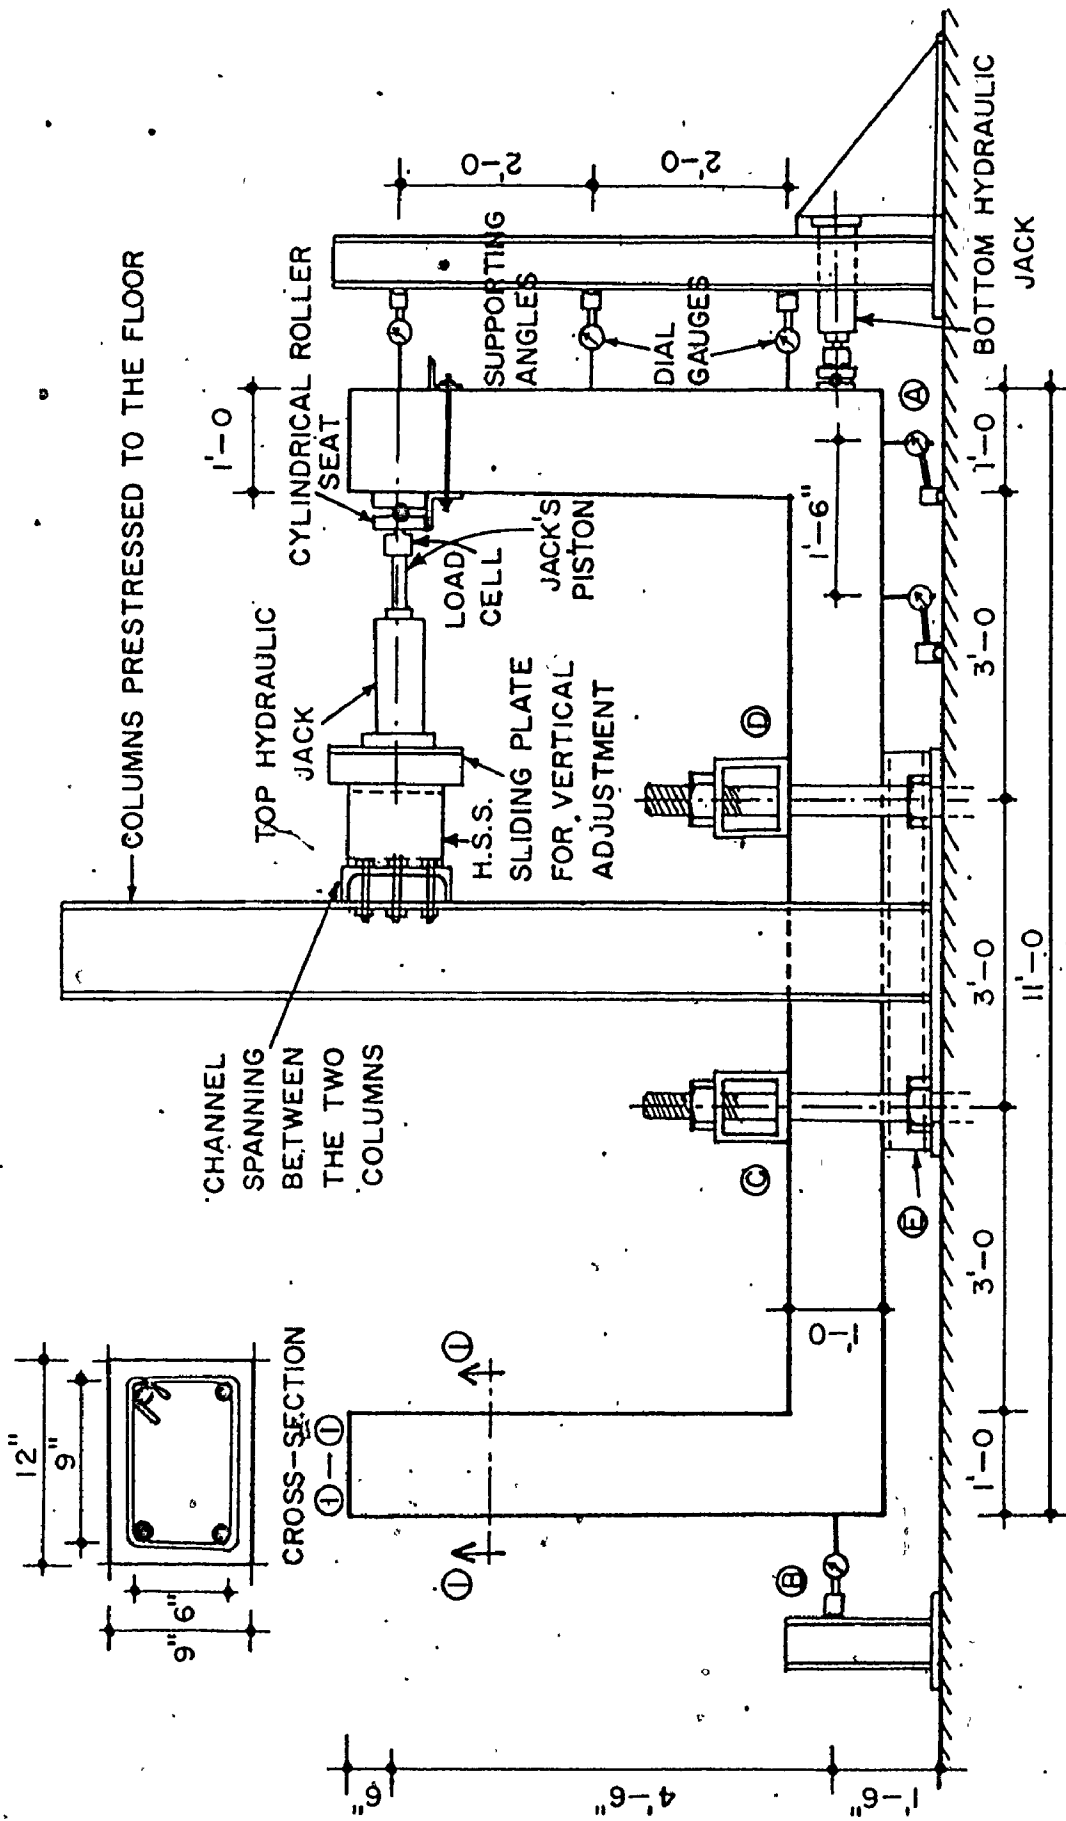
SCHEMATIC DRAWING OF THE JOINT SPECIMEN AND TEST ARRANGEMENT.
